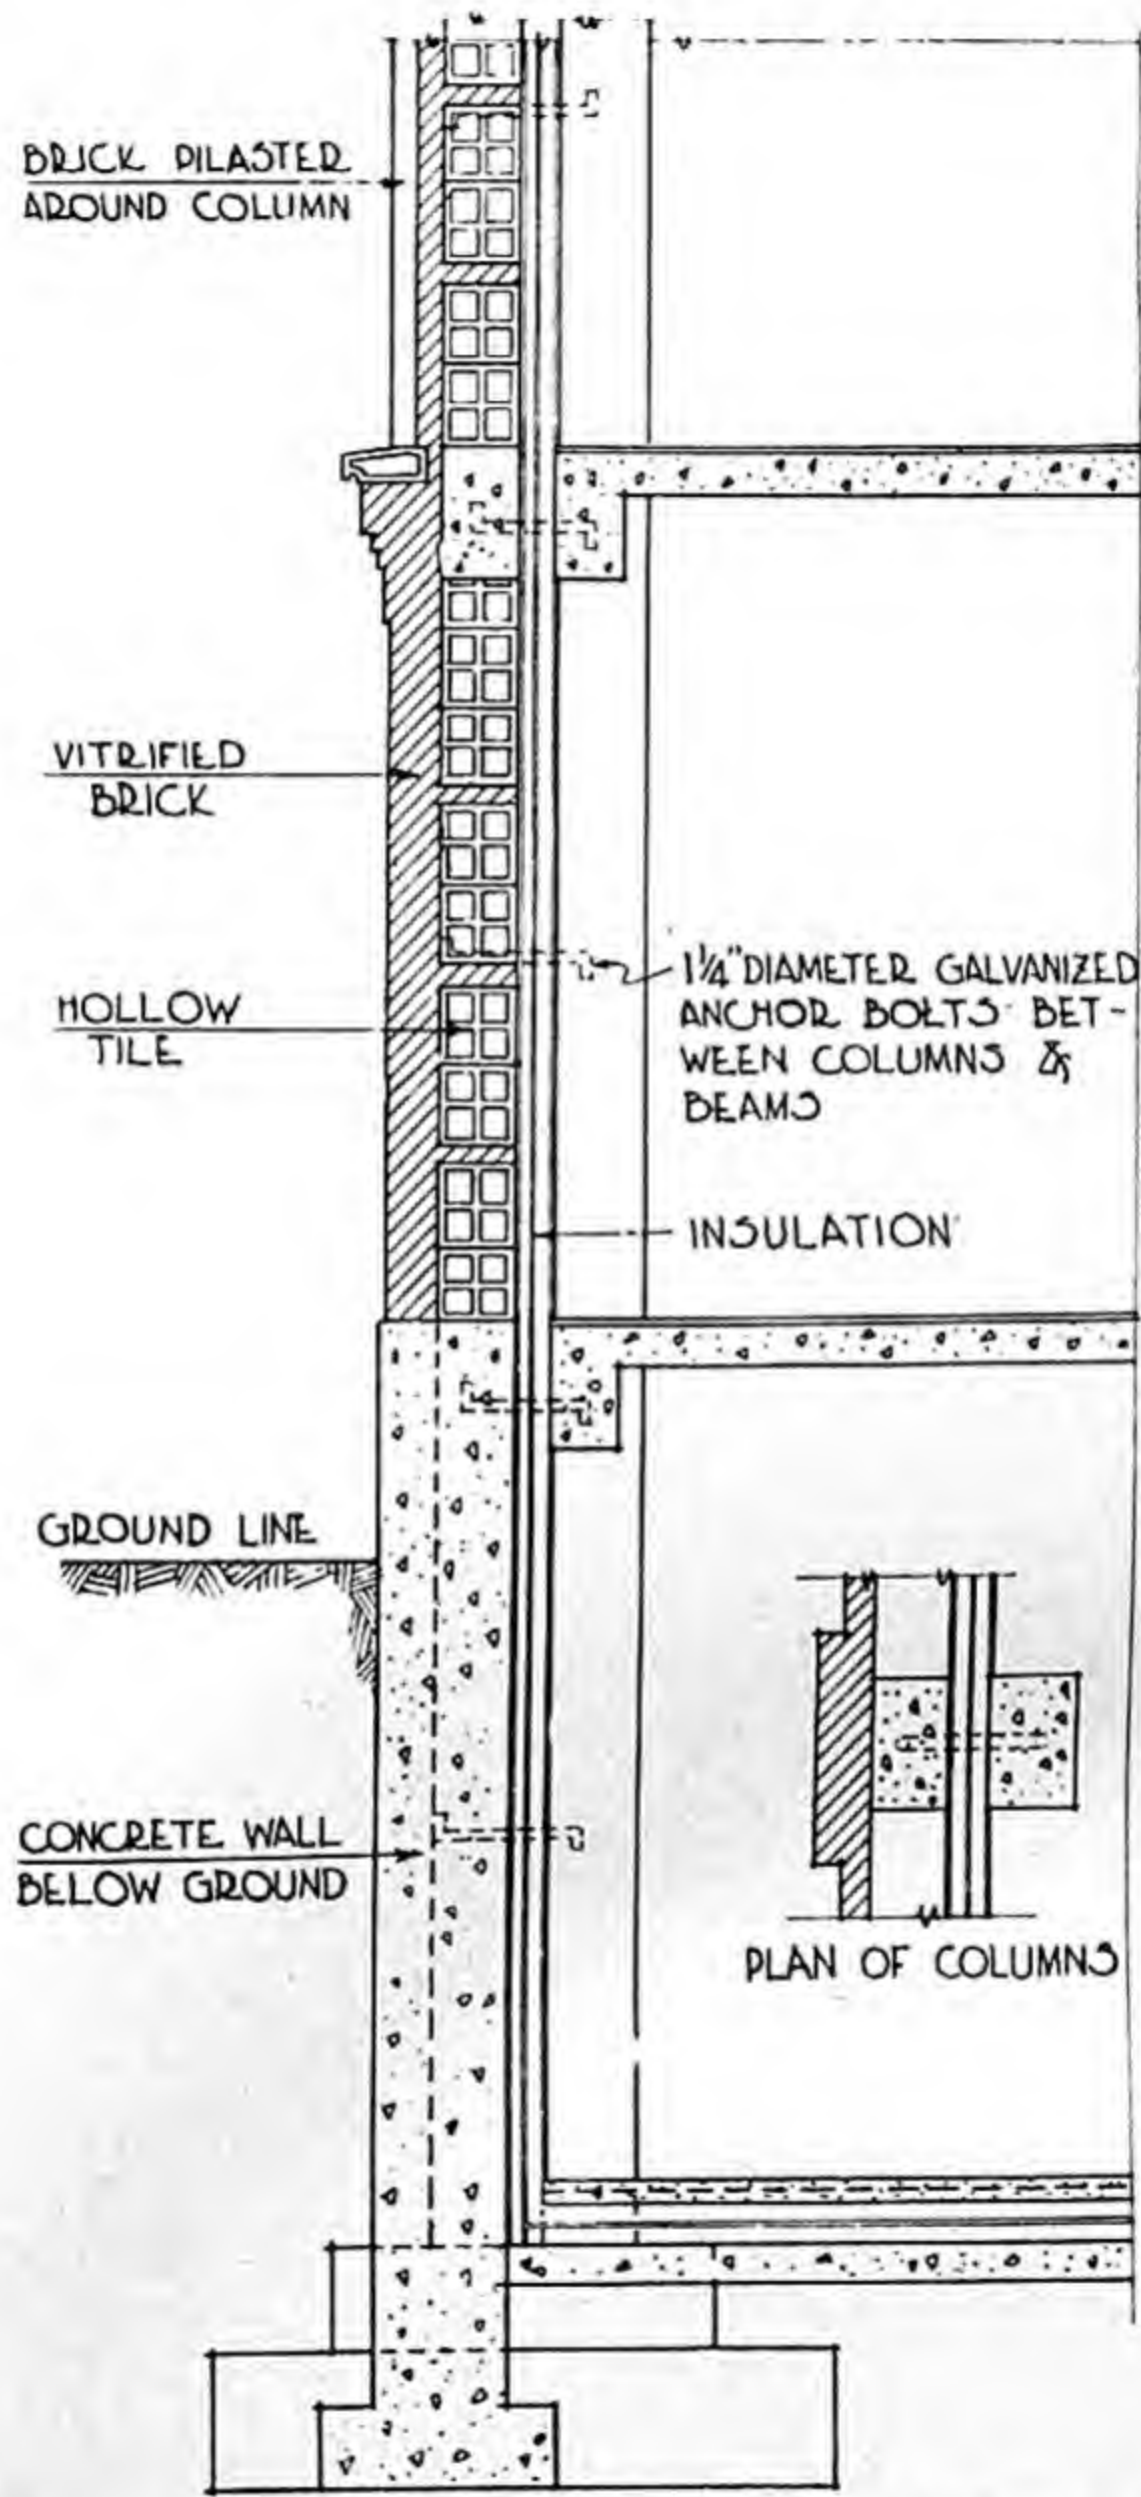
Cold Storage Wall Constructed of Hollow Tile and Brick.
